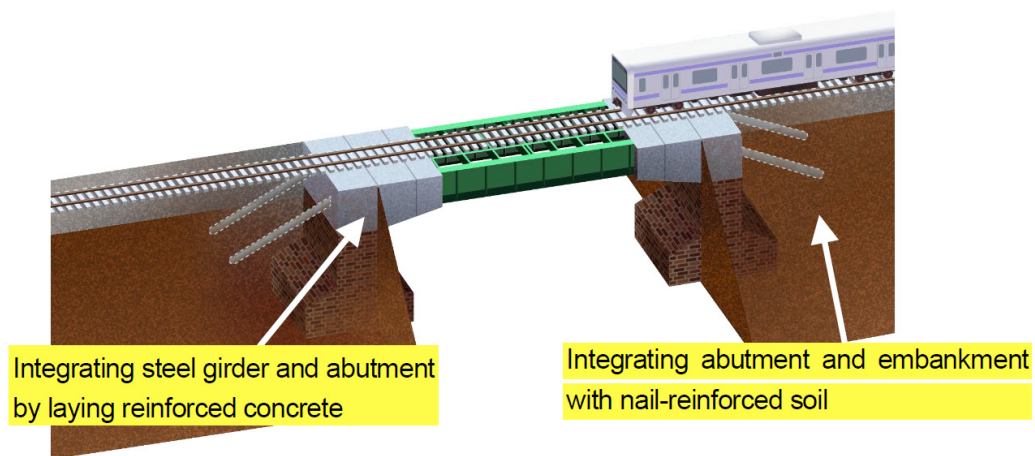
Bridge reinforcement method integrating steel girder, abutment and embankment
